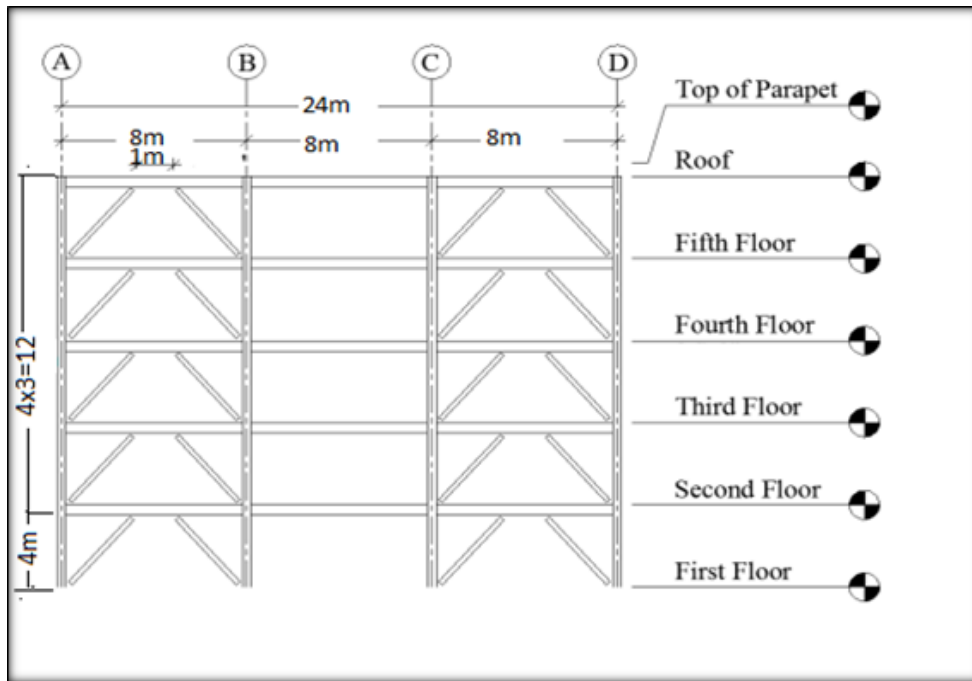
Schematic floor heights of the 5-storey steel framed structure (1-1 Section) (EBF).
